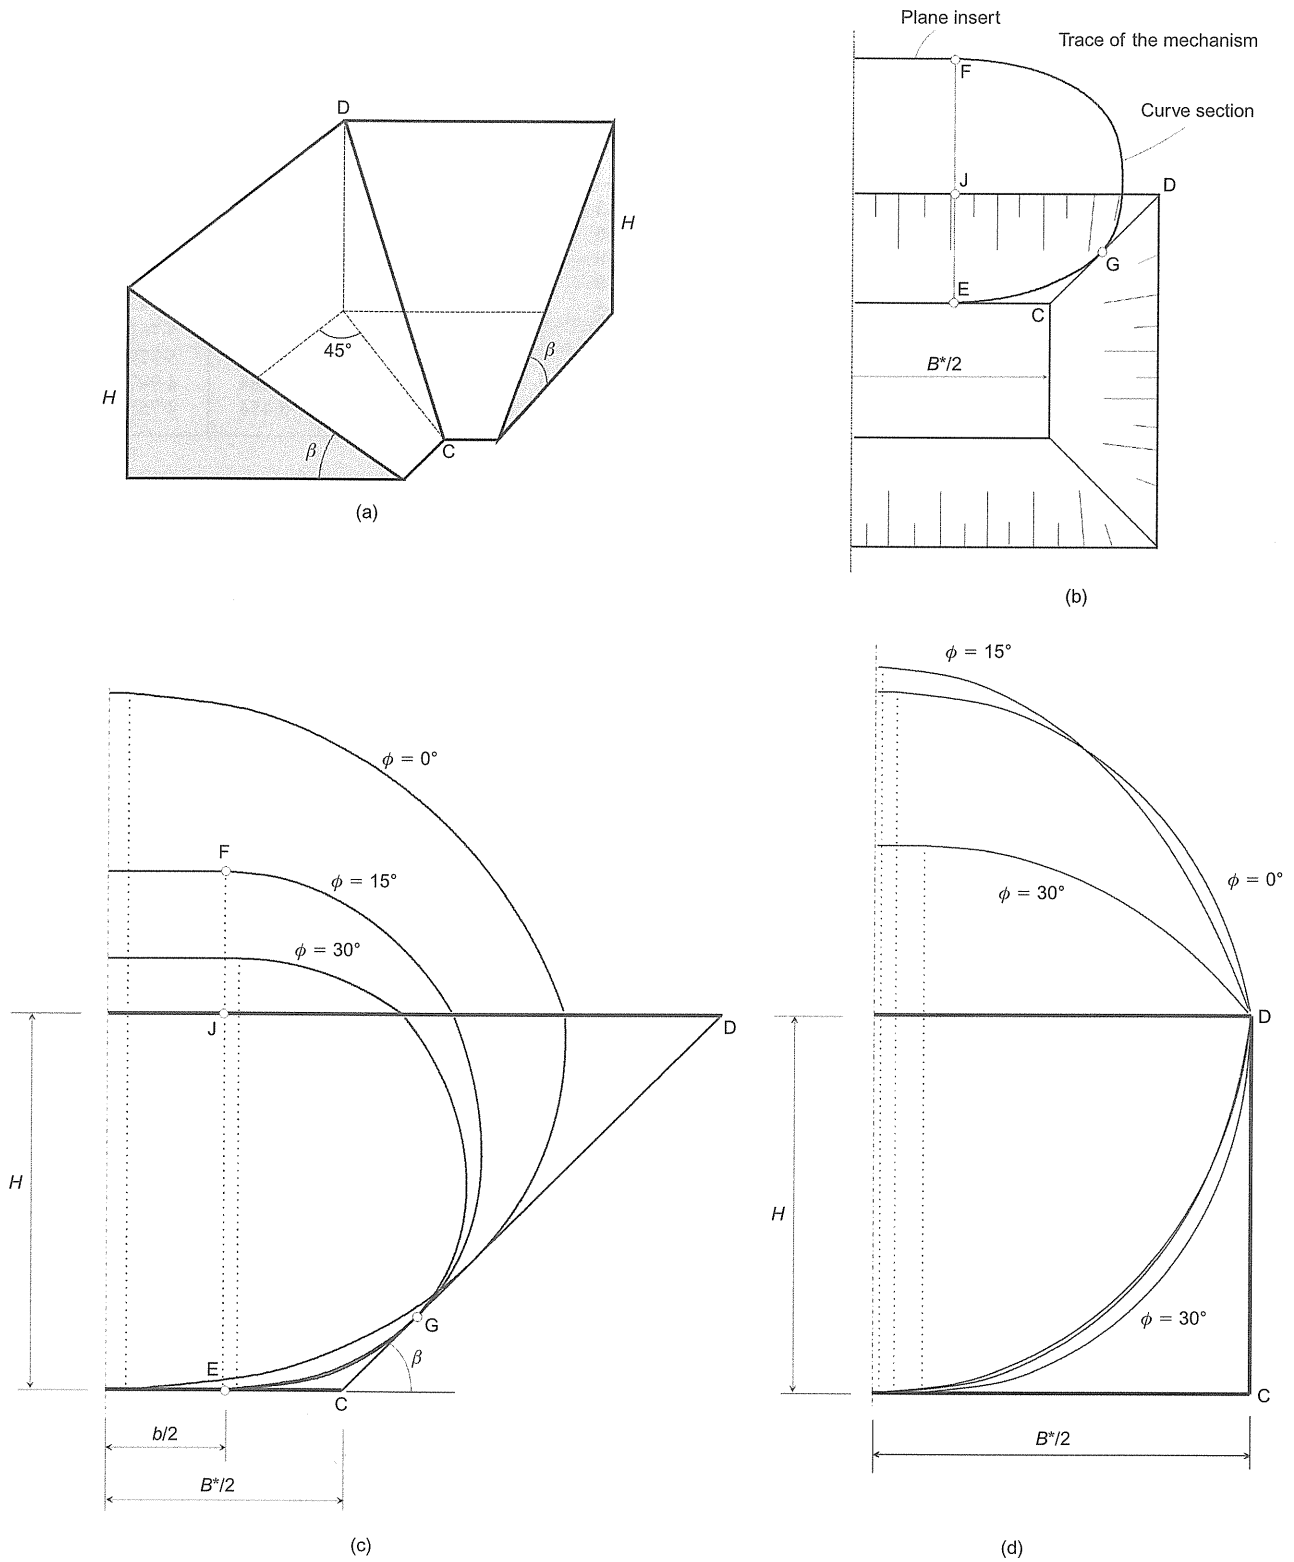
Excavation: (a) schematic view of excavation corner; (b) plan view; (c) trace of failure mechanism in excavation with slope angles of 45° and $B^*/H = 1.25$; (d) mechanism trace for vertical excavation and $B^*/H = 2$
